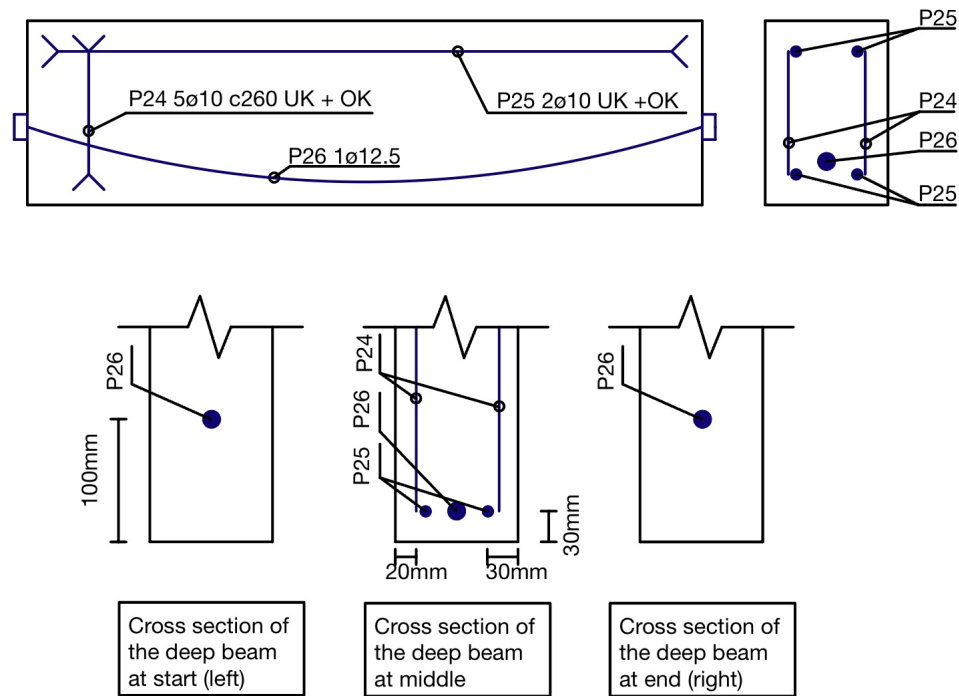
Reinforcement drawing of Model 2 with curved prestressed reinforcement
